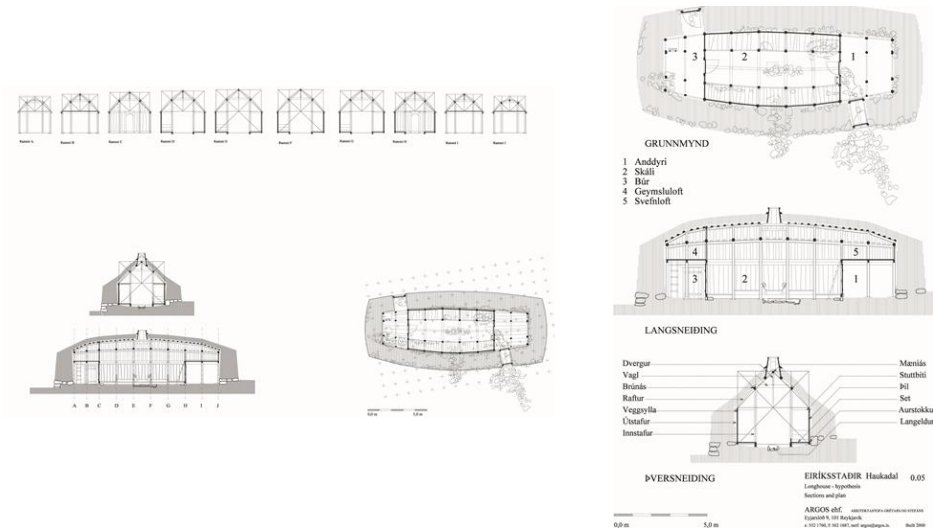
Plans of the full-scale replica house in Eiríksstaðir (Argos ehf.).
